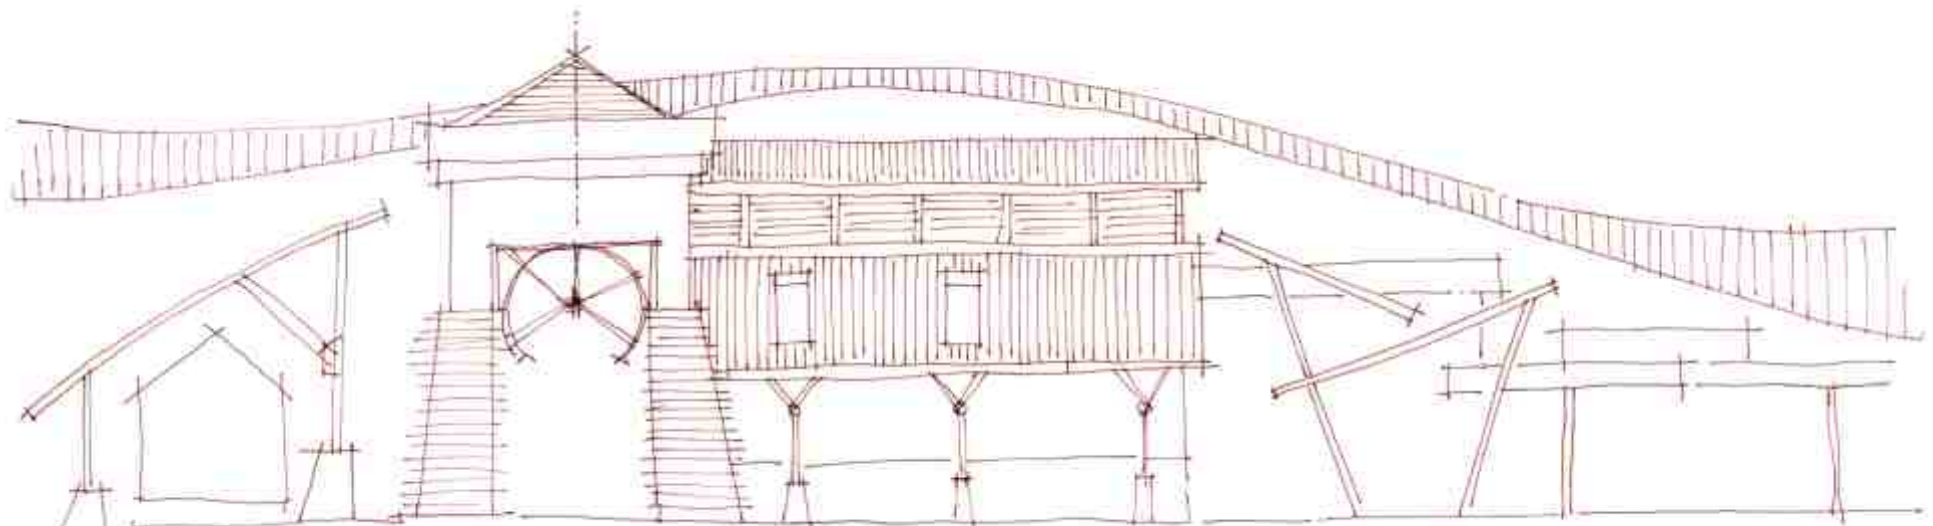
Proposed new Station Building in Early Sketch showing the design elements played with to create a sense of place to this important public forum building.
